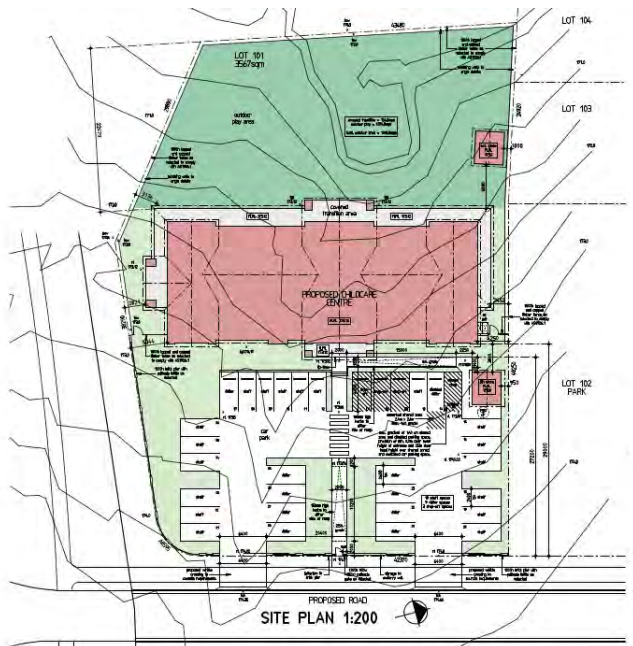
Child care facility site plan (Extracted from Child care facility Architectural Plans)
